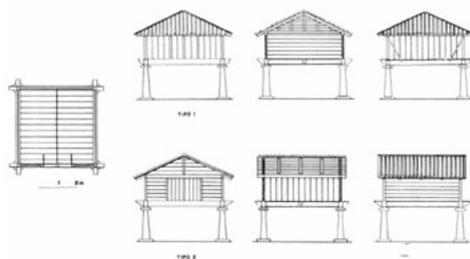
Hórreos* in Valdeón. Valley. Elevation, floor plan and section. Drawing (Source: Luermo Varela, 1995).
